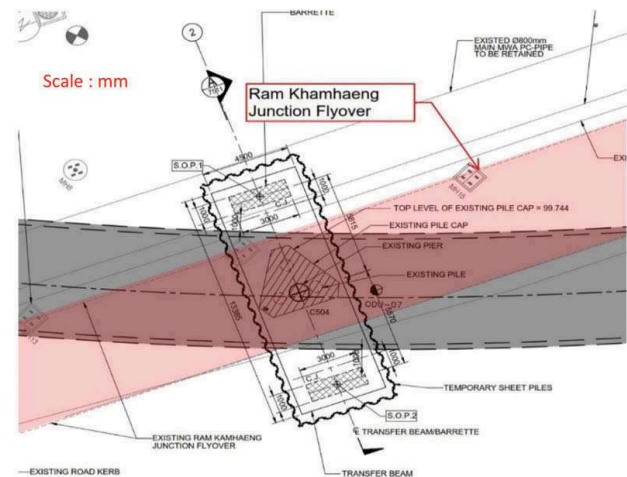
Site location plan of Ram Khamhaeng Junction Flyover to be underpinned at CH.28+200.
